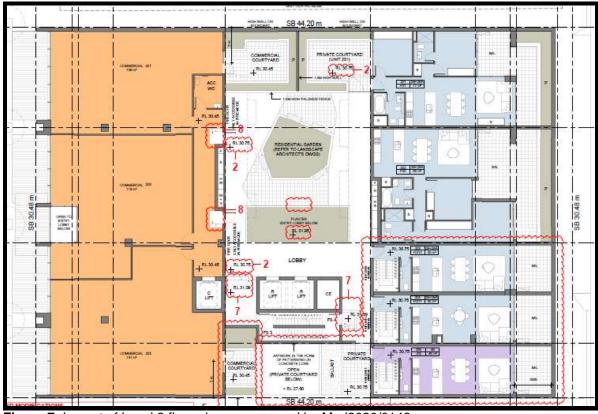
Layout of Level 2 floor plan as approved by Mod2020/0148
